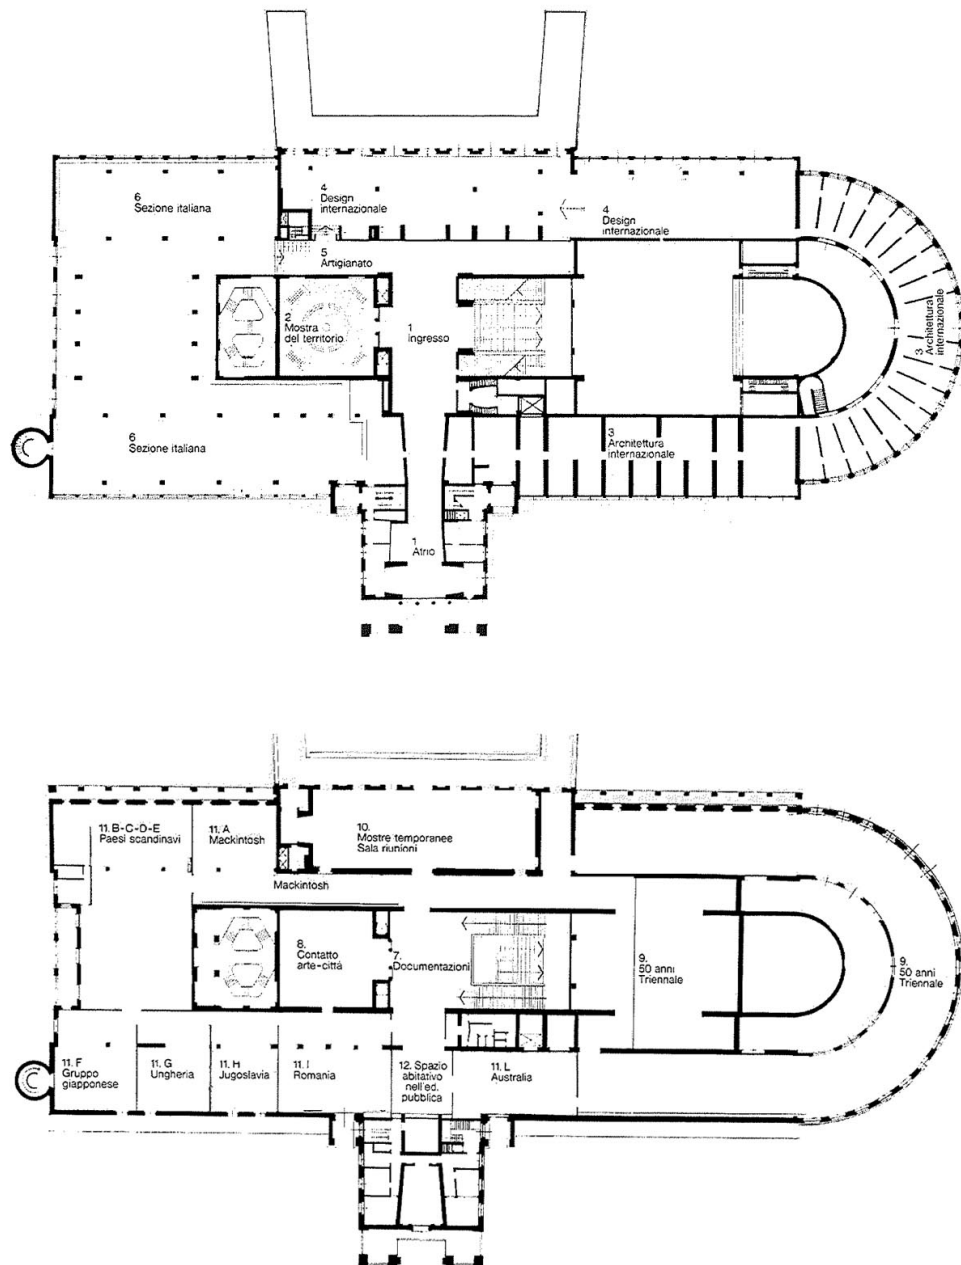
XV Triennale of 1973: Floor Plans. First floor plan (Above) and Second floor plan (Below); Piero Giangaspro, *Quindicesima Triennale di Milano: Esposizione Internazionale delle Arti Decorative e Industriali Moderne e dell'Architettura Moderna; Palazzo dell'Arte al Parco, Milano, 20 Settembre - 20 Novembre 1973*, (Milano: Nava, 1973), 23-24. Edited by Author. For a more detailed plan of the International section, see Appendix C.
